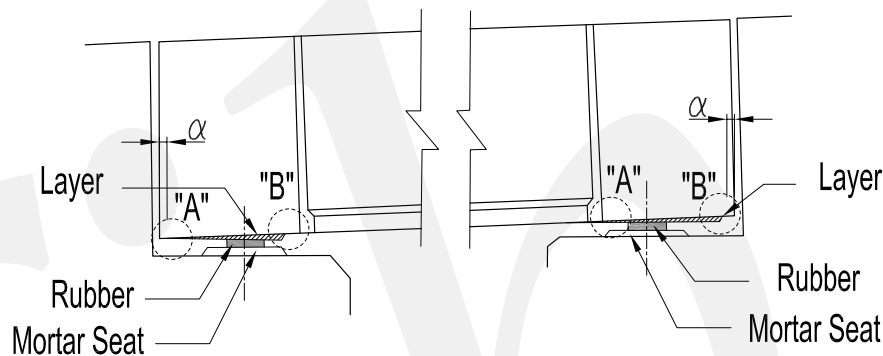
Detail of the bearings. Note:  $\alpha$  = Distance between abutment and girder end.
